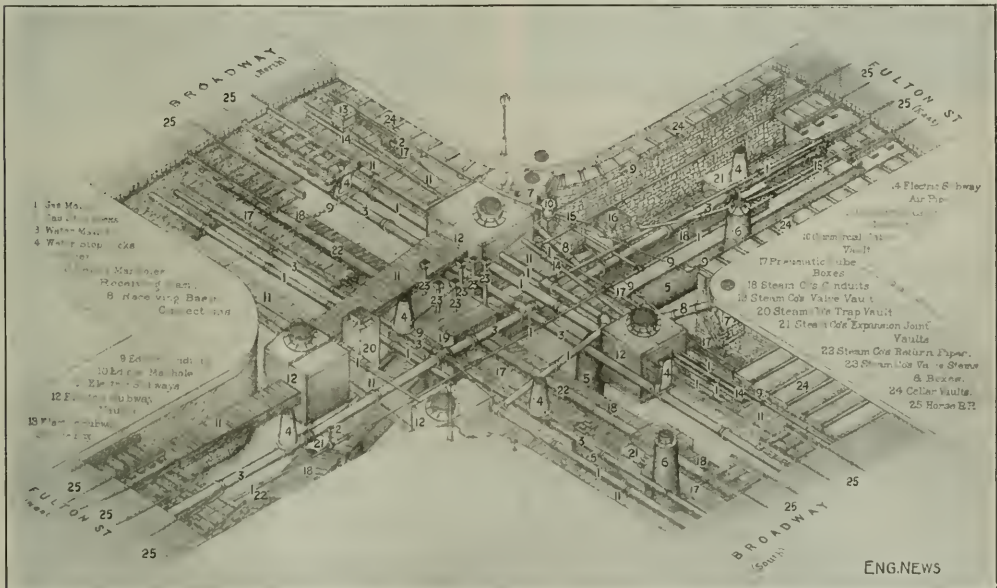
ISOMETRIC VIEW OF UNDERGROUND PIPING AT THE INTERSECTION OF BROADWAY AND FULTON ST. IN 1890
